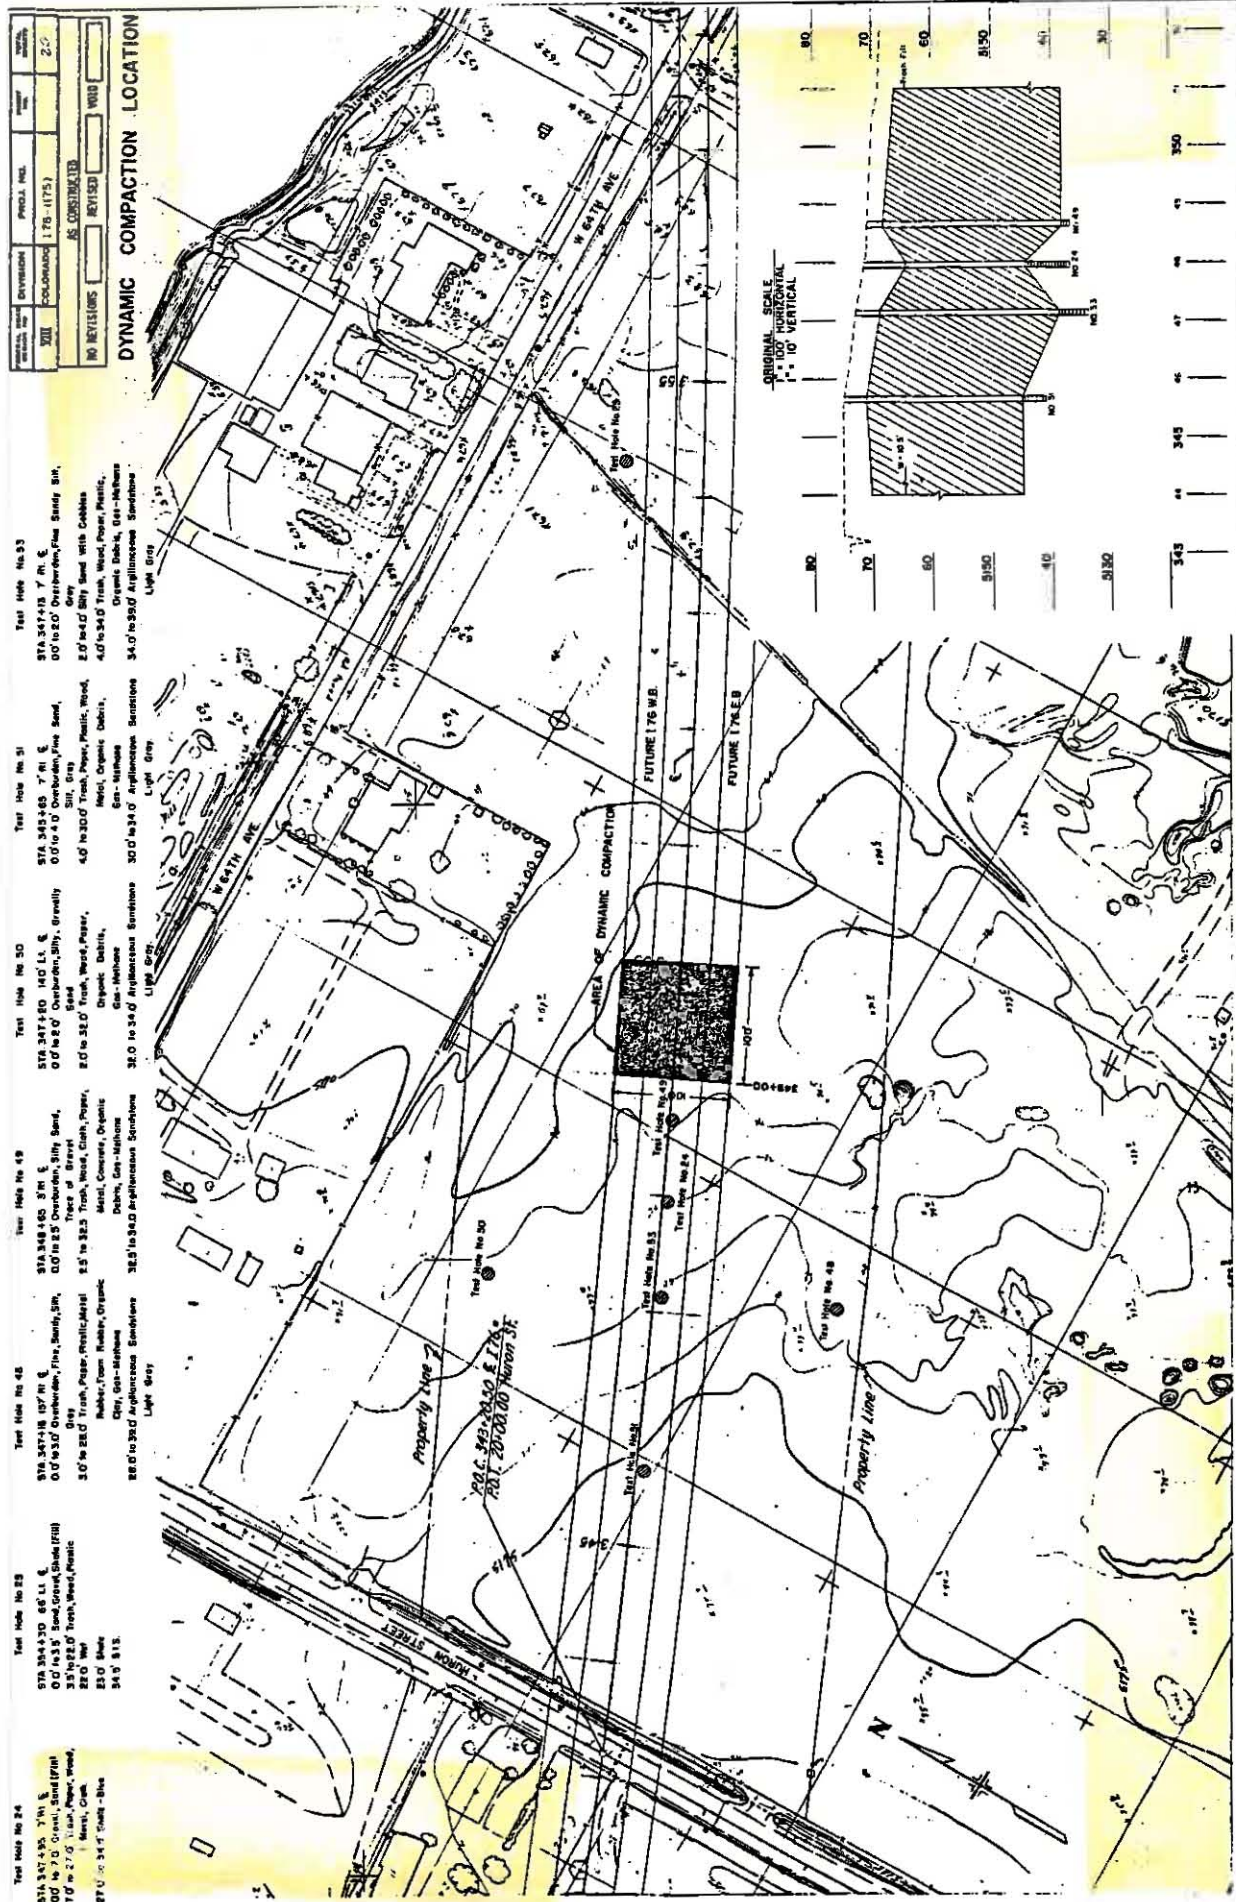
LOCATION OF SITE B WITH TEST SECTION NO. 2
